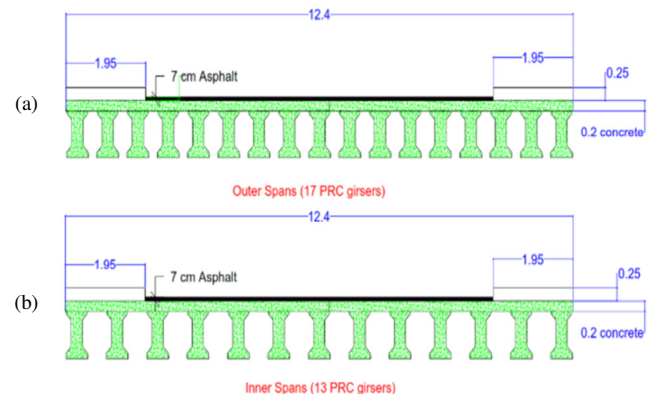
Bridge deck geometry details (dimensions in m): (a) outer spans, (b) inner spans.
